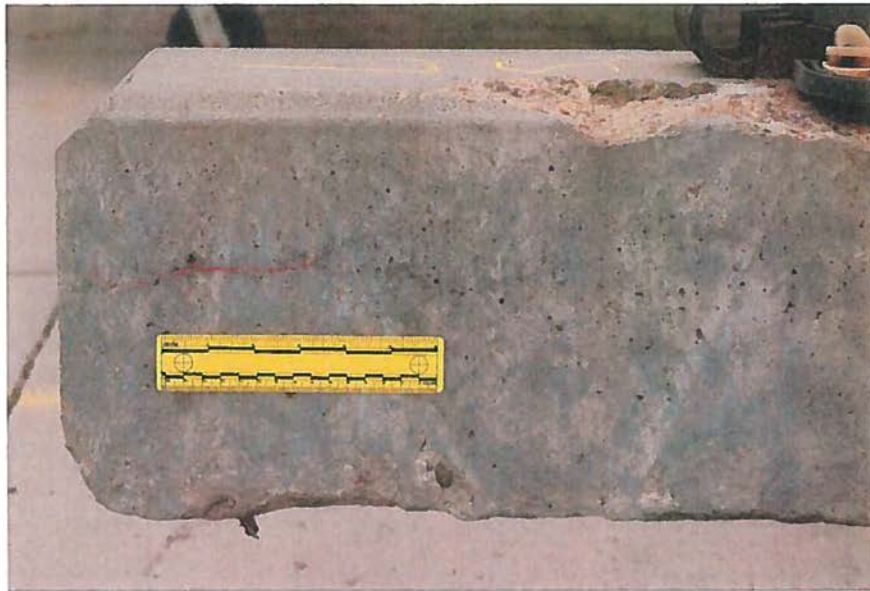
South end of tie NDT #7 without outlining of cracks. L3672 102312 11
